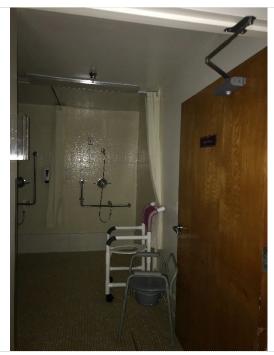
Shower room - ceramic tile floor, baseboard and walls
